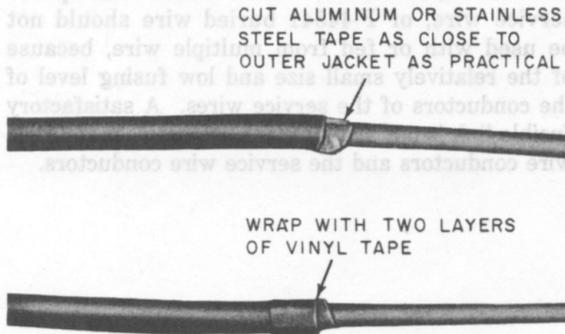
Removal of Aluminum or Stainless Steel Tape
